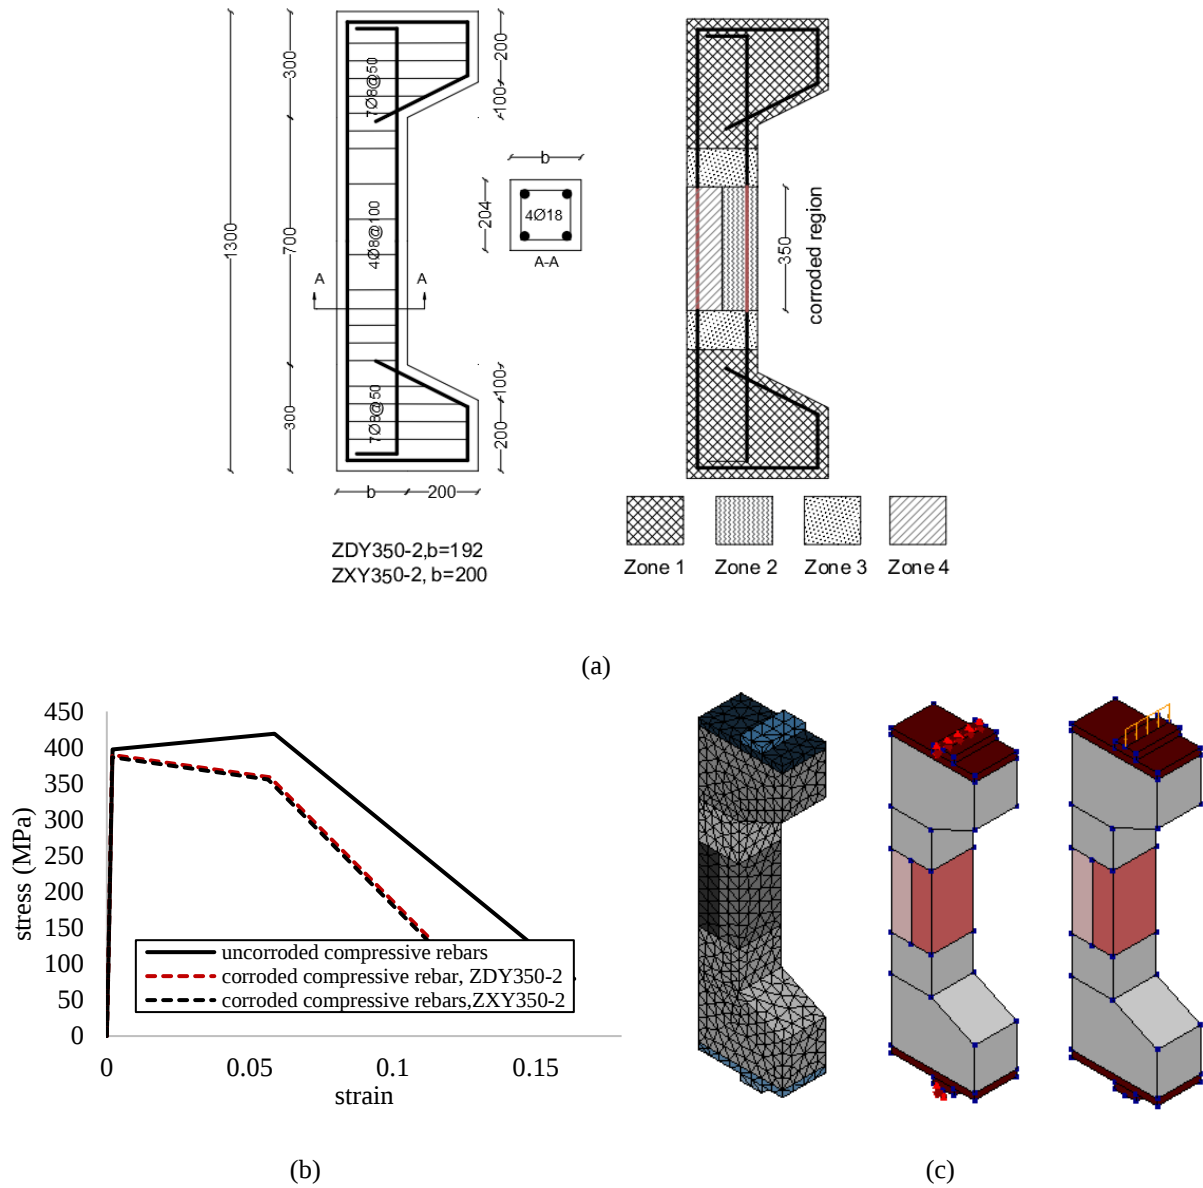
(a) Details of columns (casting side) tested by Wang and Liang (2008), all dimensions in mm; (b) compressive stress-strain response of the rebars; (c) modelling details: meshing, supports, loading
